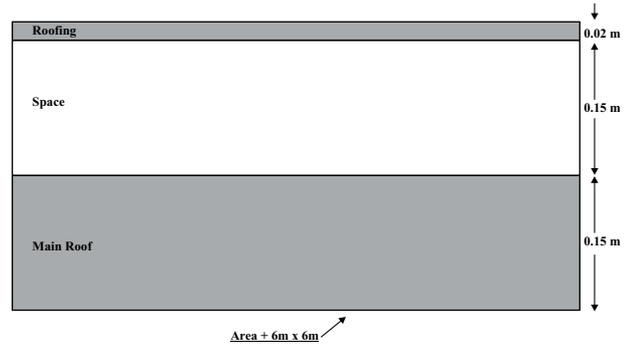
(a) Dimensions ( not to scale) of the proposed enclosed space showing the roofing, air space for evaporation of water and the main roof of the room
